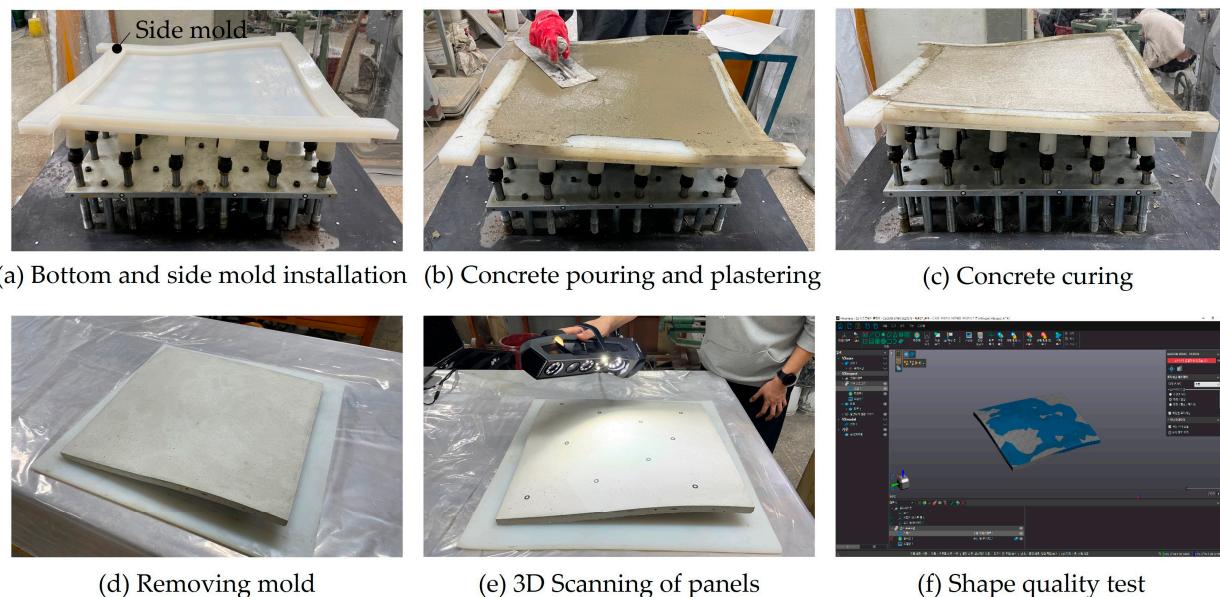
FCP manufacturing equipment lower multi-point press equipment performance test [12].
